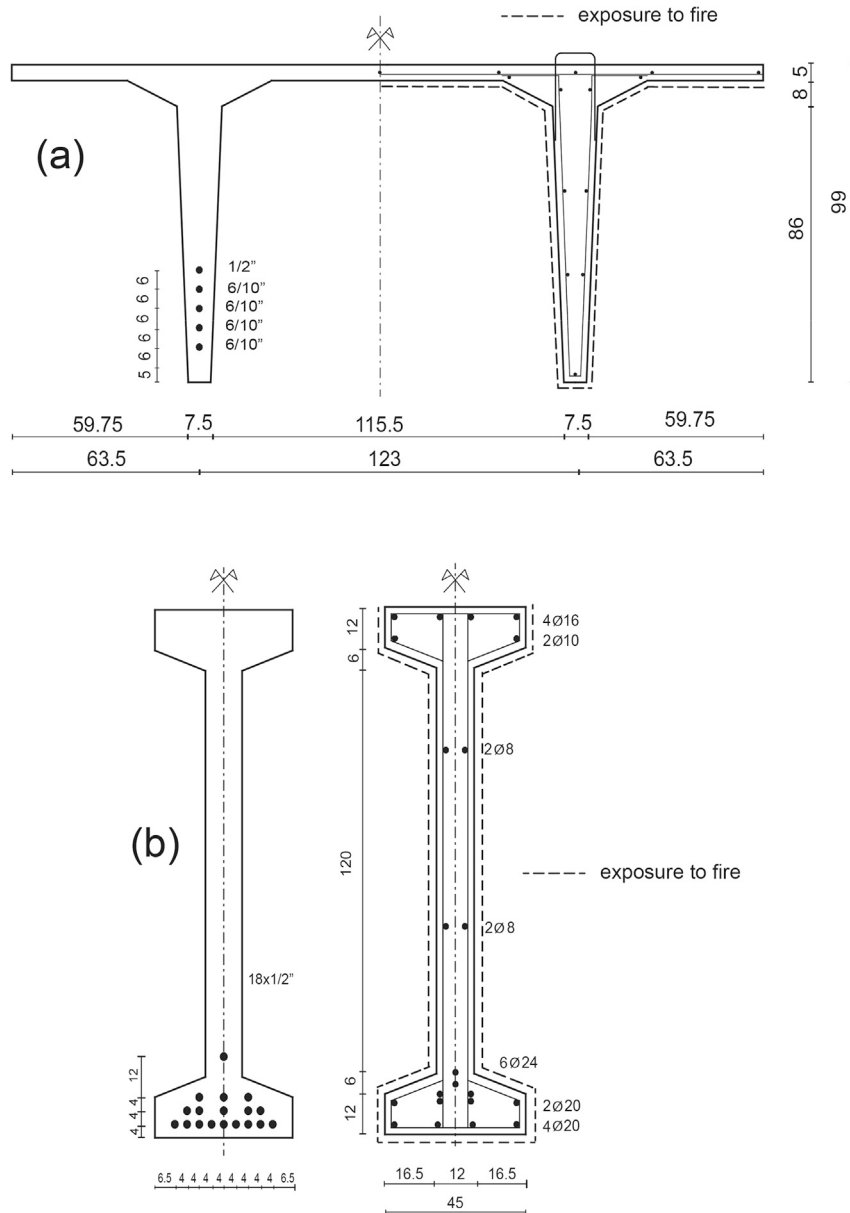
Prestressed sections considered in the numerical analyses (prestressing steel on the left, ordinary steel at the right): (a) double-tee section; and (b) I-girder section.
